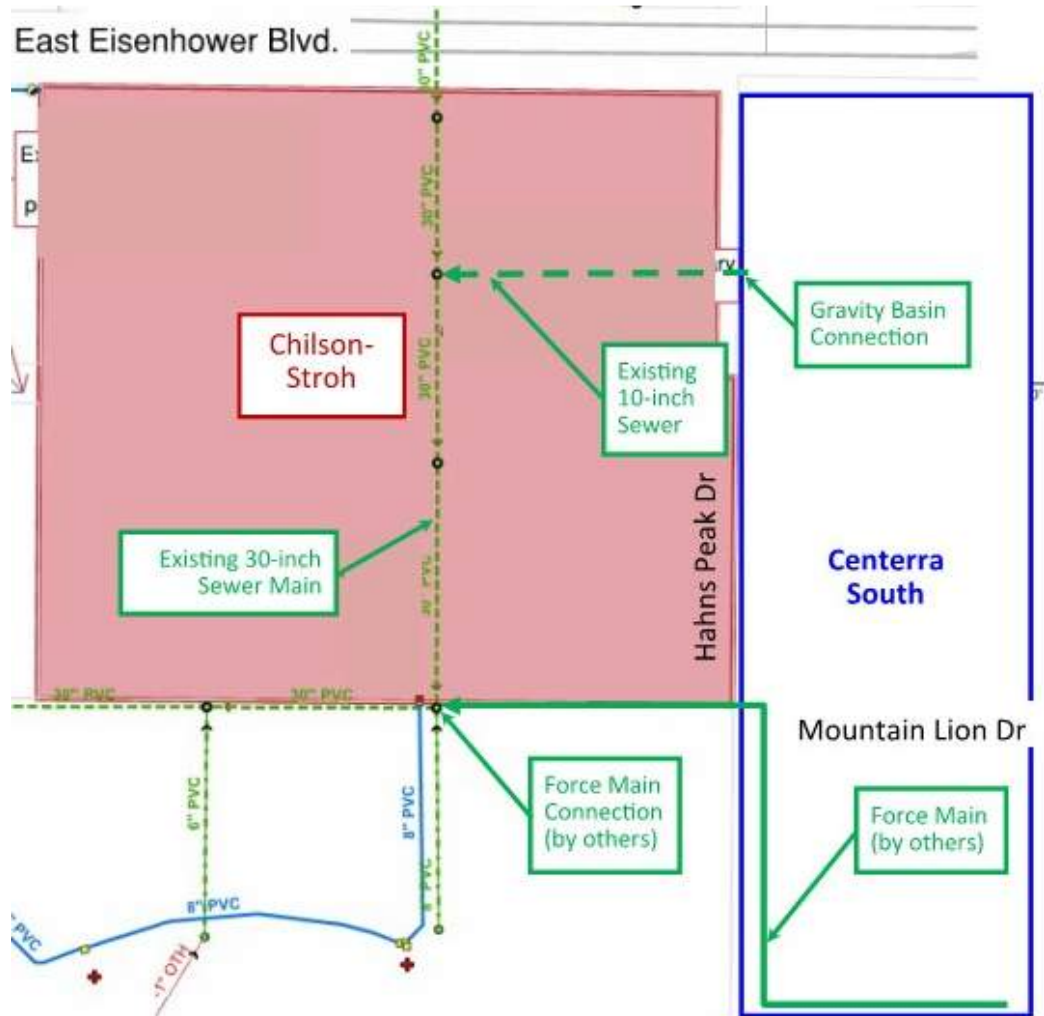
PROPOSED CONNECTIONS TO EXISTING SEWER
